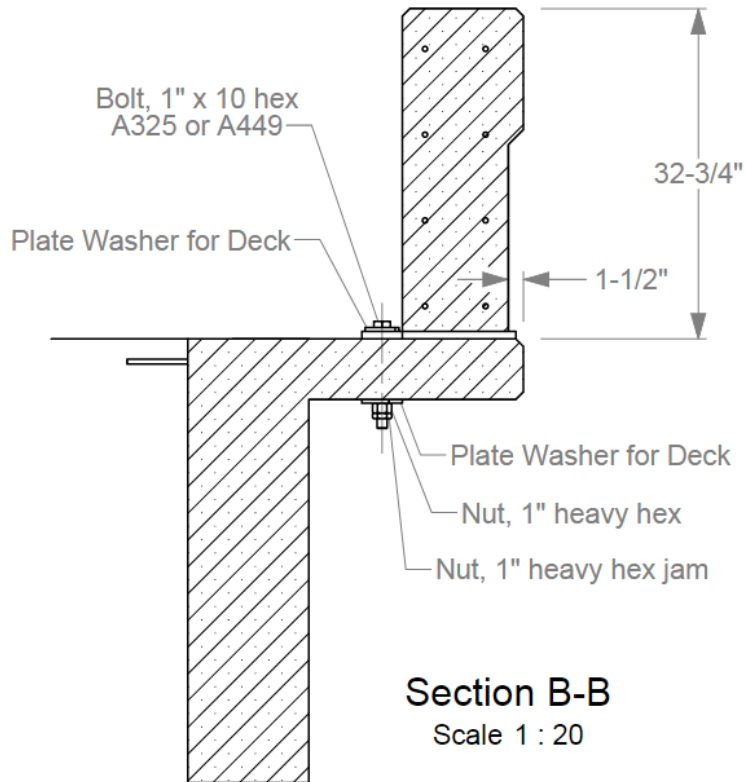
32-inch Tall Vertical Wall (TTI Test Number 490024-2-1)
